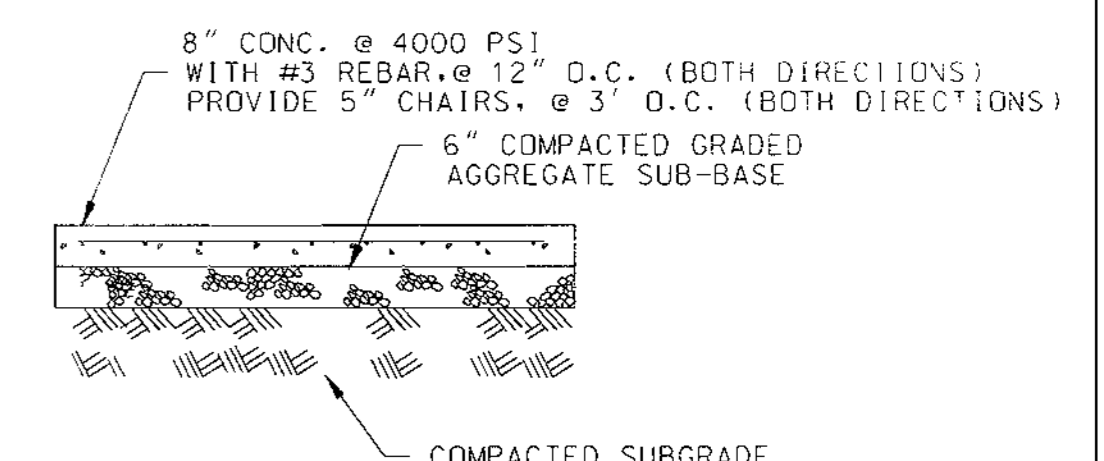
SIDEWALK RAMP
